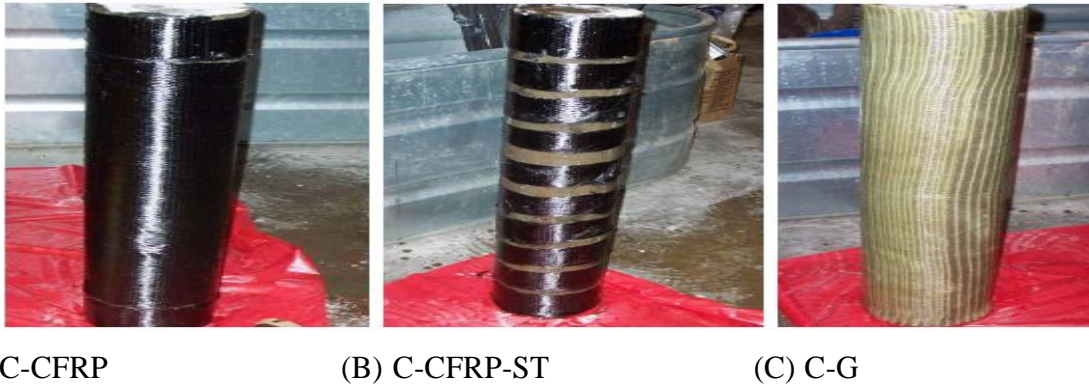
Reinforced Concrete Columns Retrofitted with FRP (Miller 2006).
